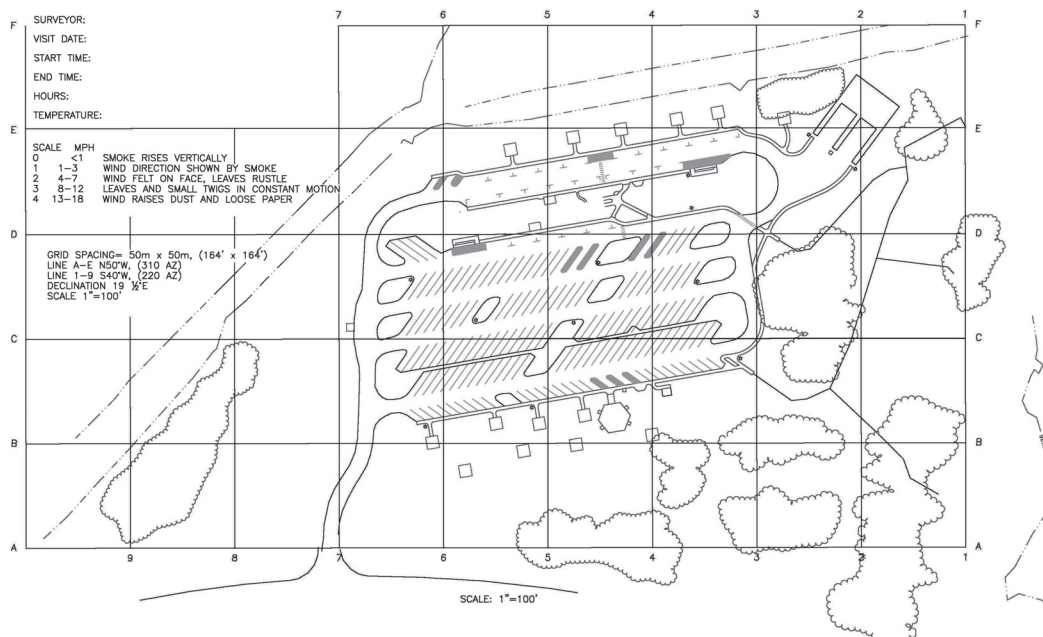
Blackwell Island study area overlain with a grid system and a schematic drawing of the constructed facilities.
